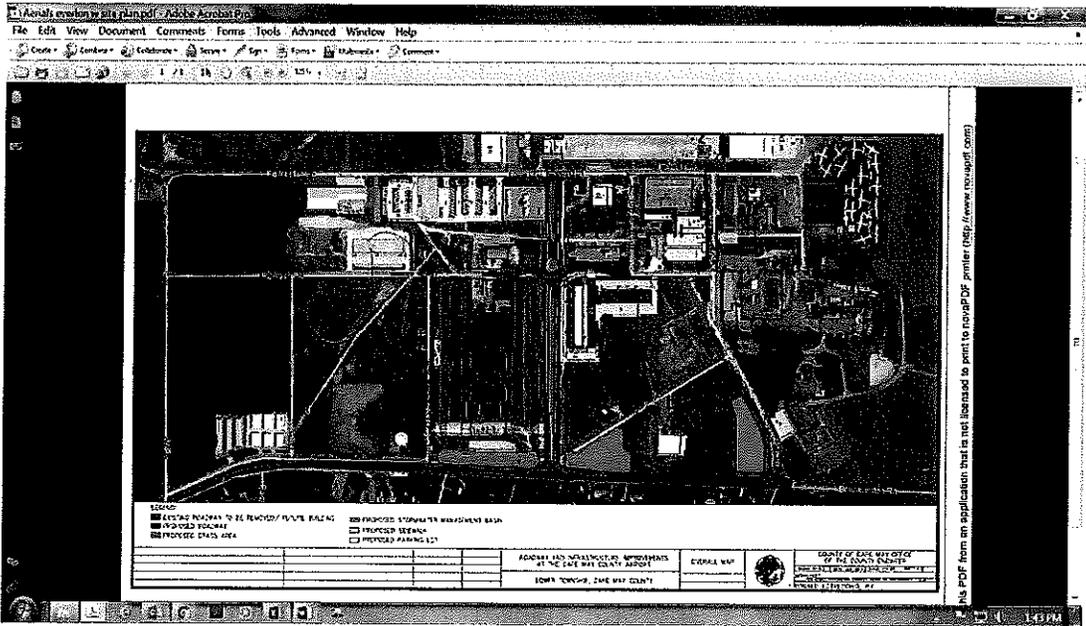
Overall Airport and Redevelopment Area Site Plan and Building Location Layout
